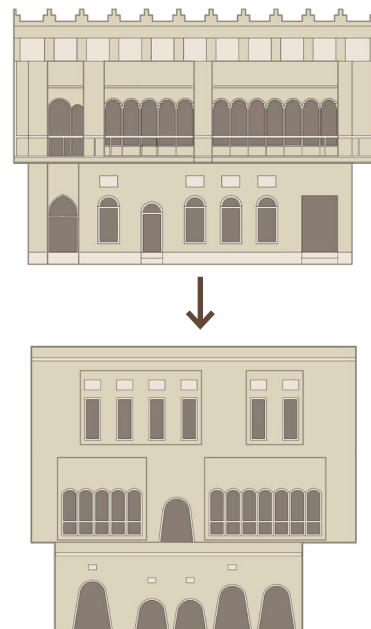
Adaptation of traditional architectural elements to a contemporary building\
